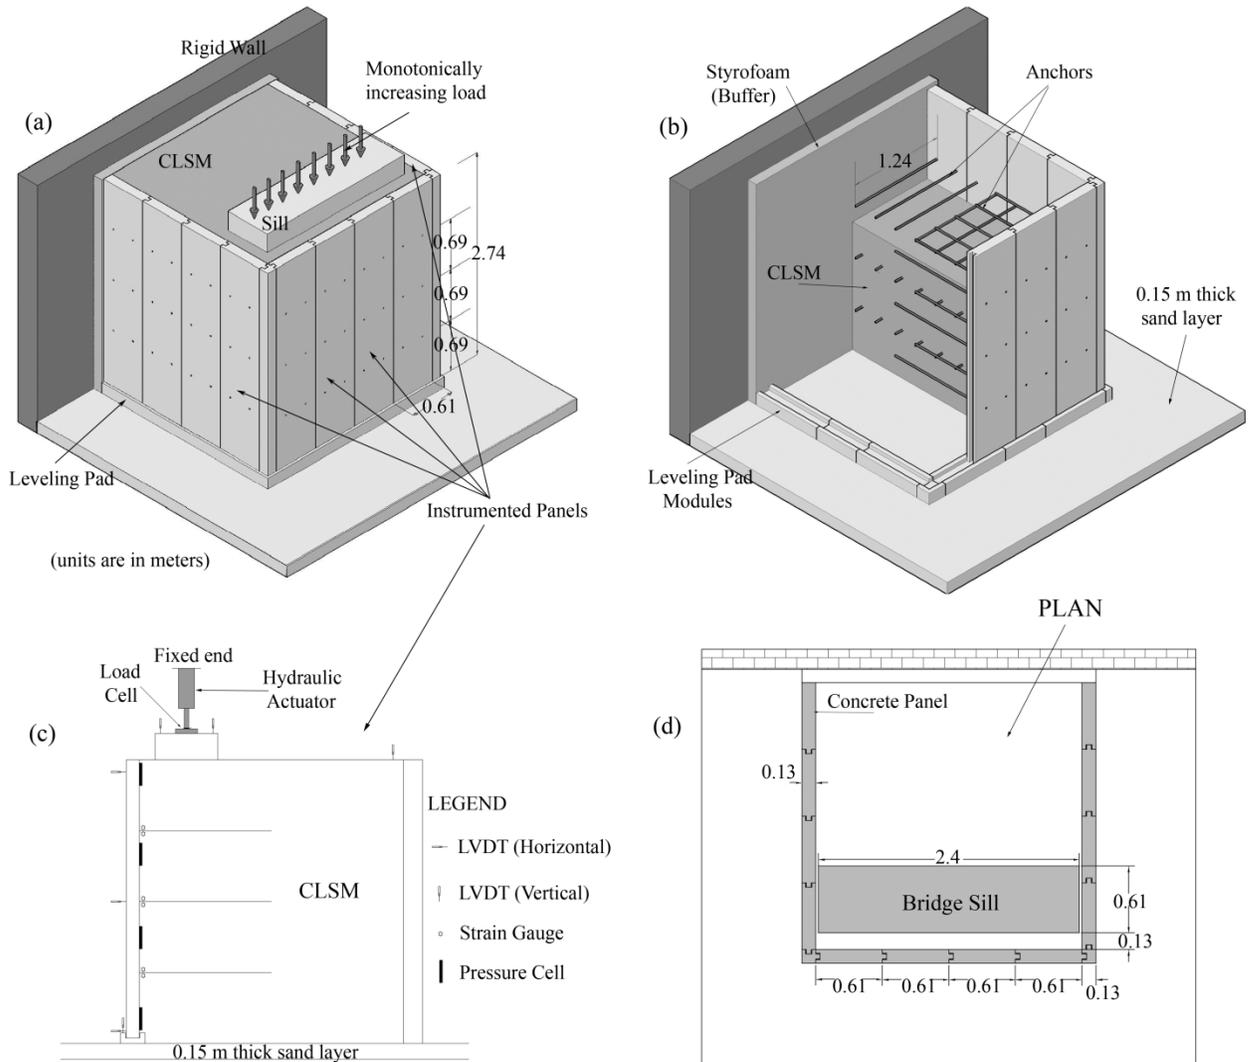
Configuration of the CLSM Bridge Abutment Test
